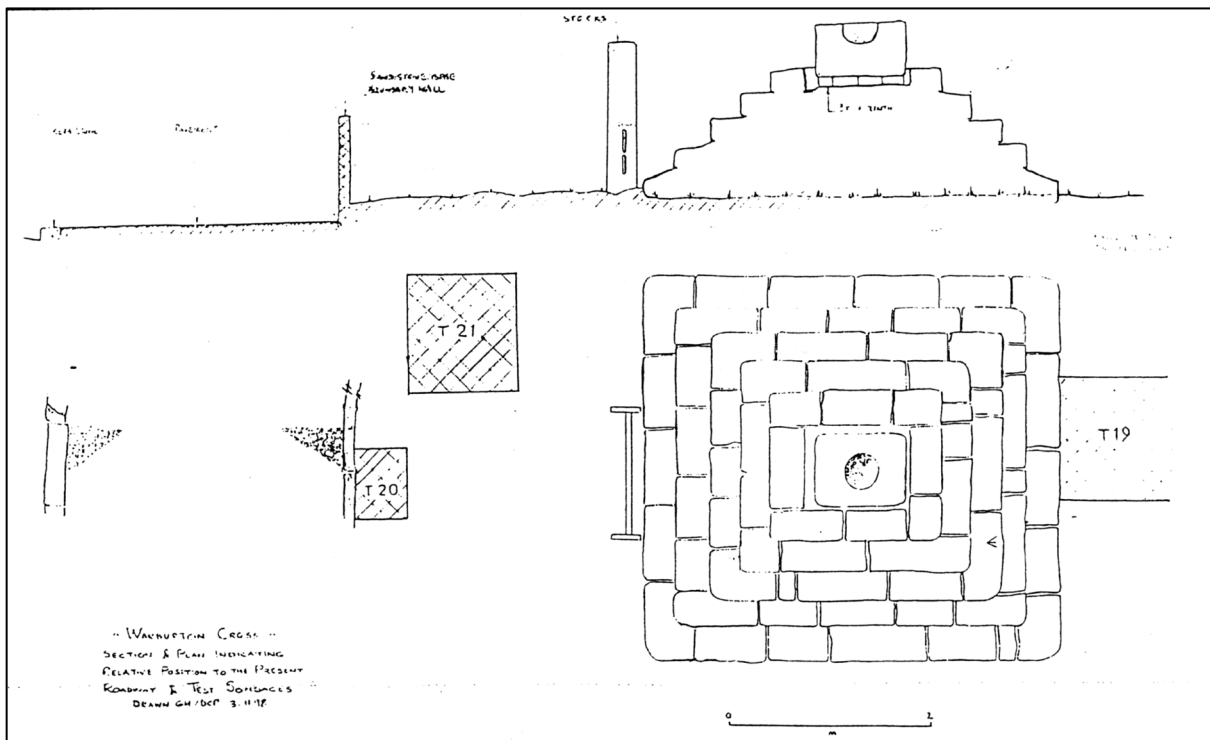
Details of the Warburton cross trenches and survey, 1998.
